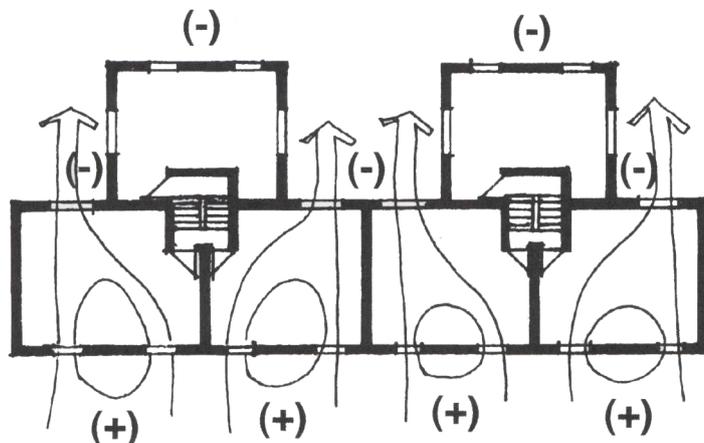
Ventilation potential in direct-access building with internal staircase (type-3)
